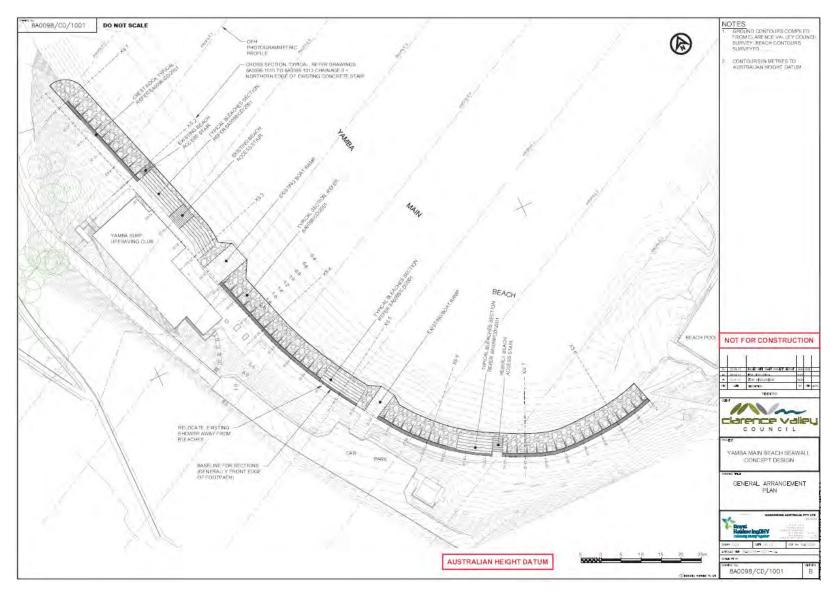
Yamba Main Beach seawall replacement - general arrangement plan
